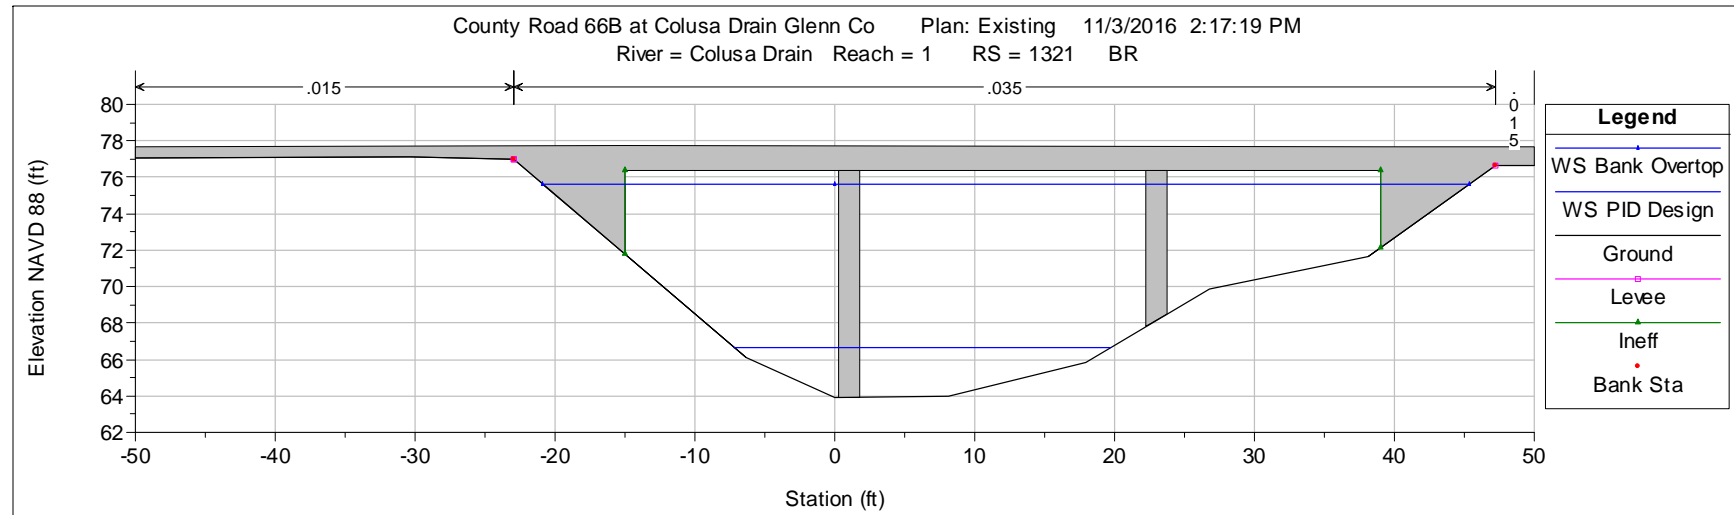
Water Surface Elevation at the Upstream Face of the Existing Bridge (Looking Downstream)
